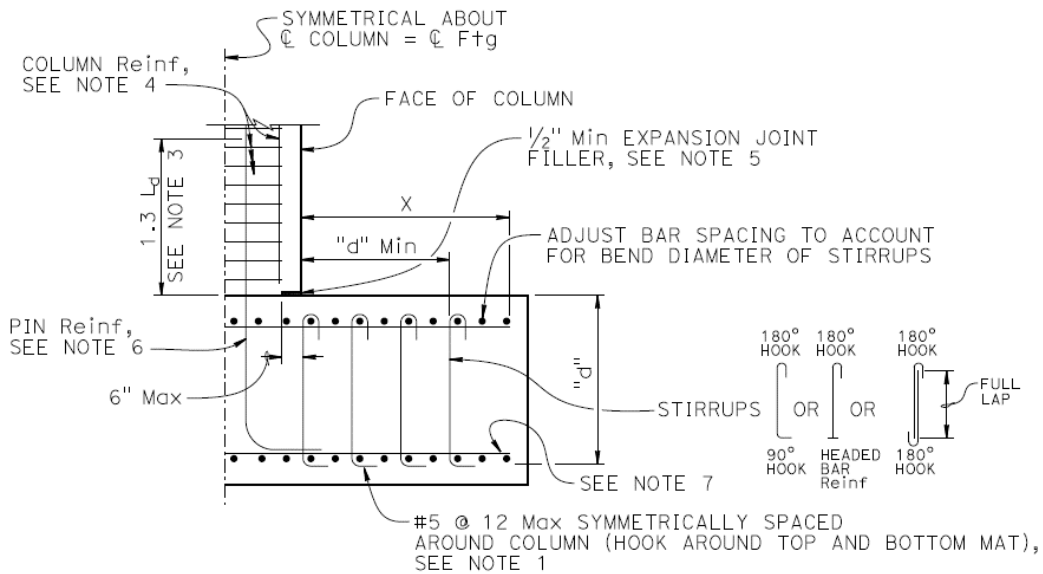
Footing Reinforcement Pinned Column (see also *Seismic Design Criteria* Figure C6.2.2.5-1)
